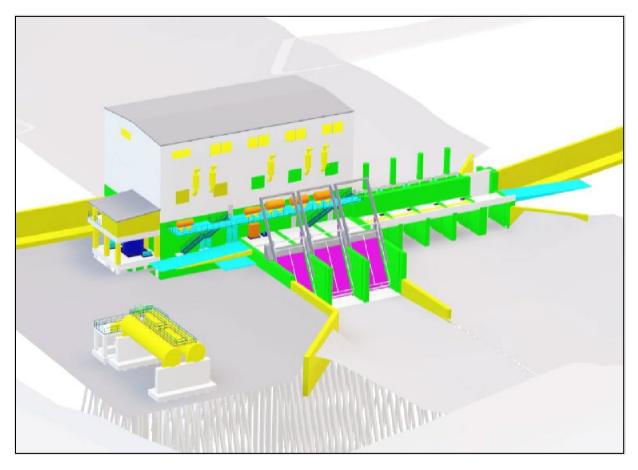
Typical Site Plan of a Pump Station with Large Pumping Capacity
